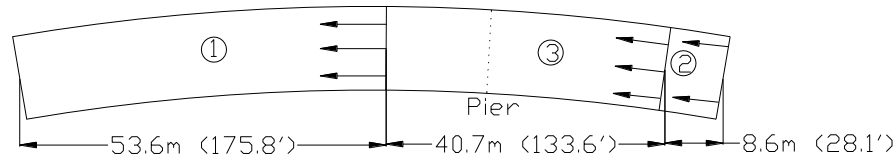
Stage 4 of Construction for Paired Girder (Inner Girders Placed First) Erection of Two Unequal Spans, 4-Girder, 305-m (1000-ft) Radius Bridge.
